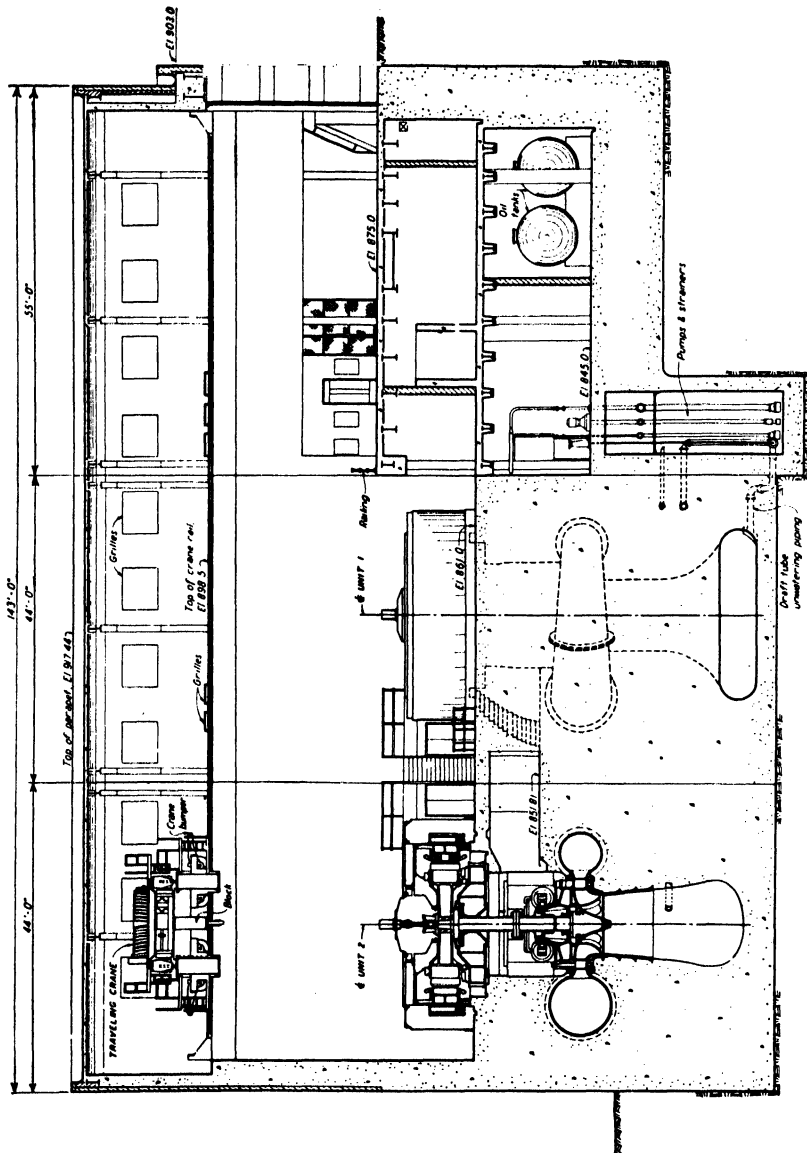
Longitudinal section, powerhouse, Apalachia project.
